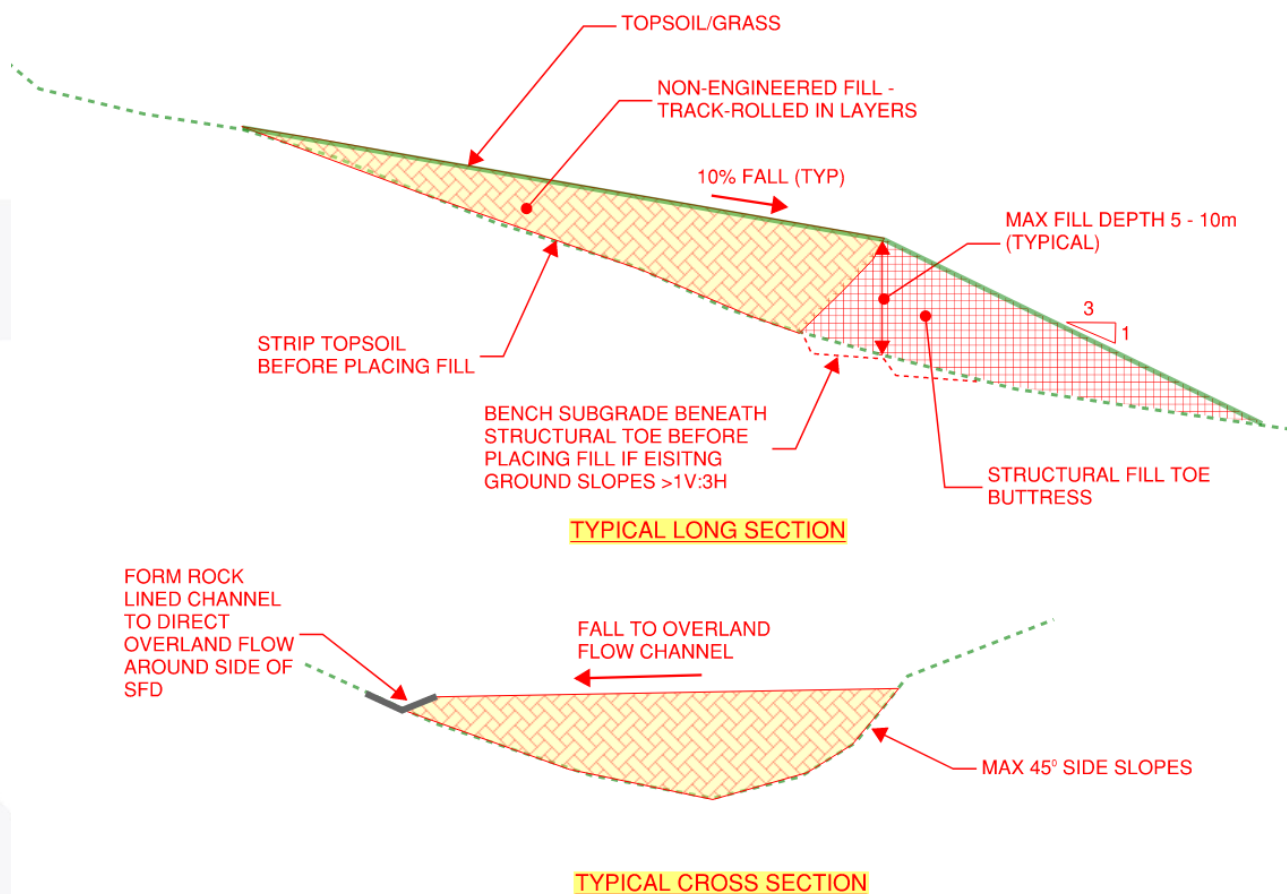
Gully Type Surplus Fill Disposal Site – Typical Sections
